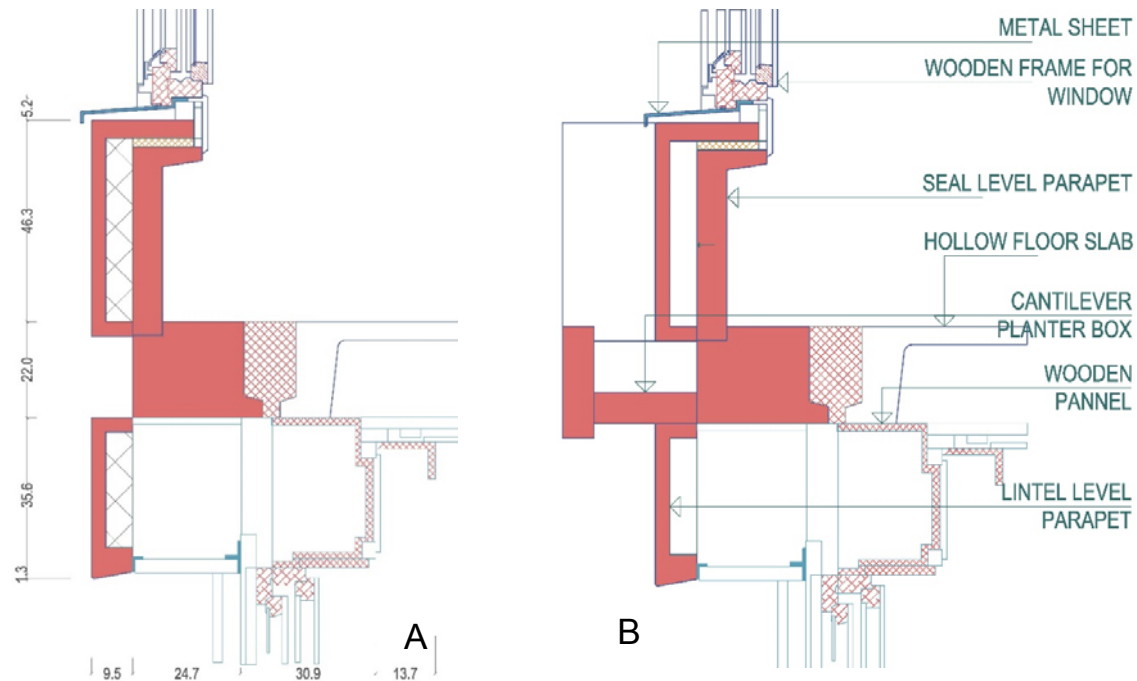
Facade cladding system: (a) Joint between floor slab and parapet panel (b) Joint between floor slab planter box (Rahman, SMM 2018). Adopted from Anica Dragutinovic, according to the original drawings from Historical Archive Belgrade.
